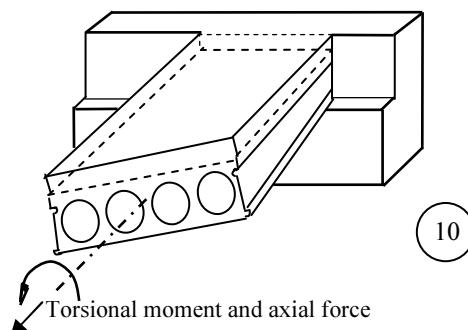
, 5-2 and 5-3 illustrate current recommended practice and compare this with previous practice used in detailing hollow-core floors. Different aspects of detailing are identified by numbers, which refer to Table 1, where these aspects are further described. The reason for changing detailing practice is also briefly outlined in the Table.
